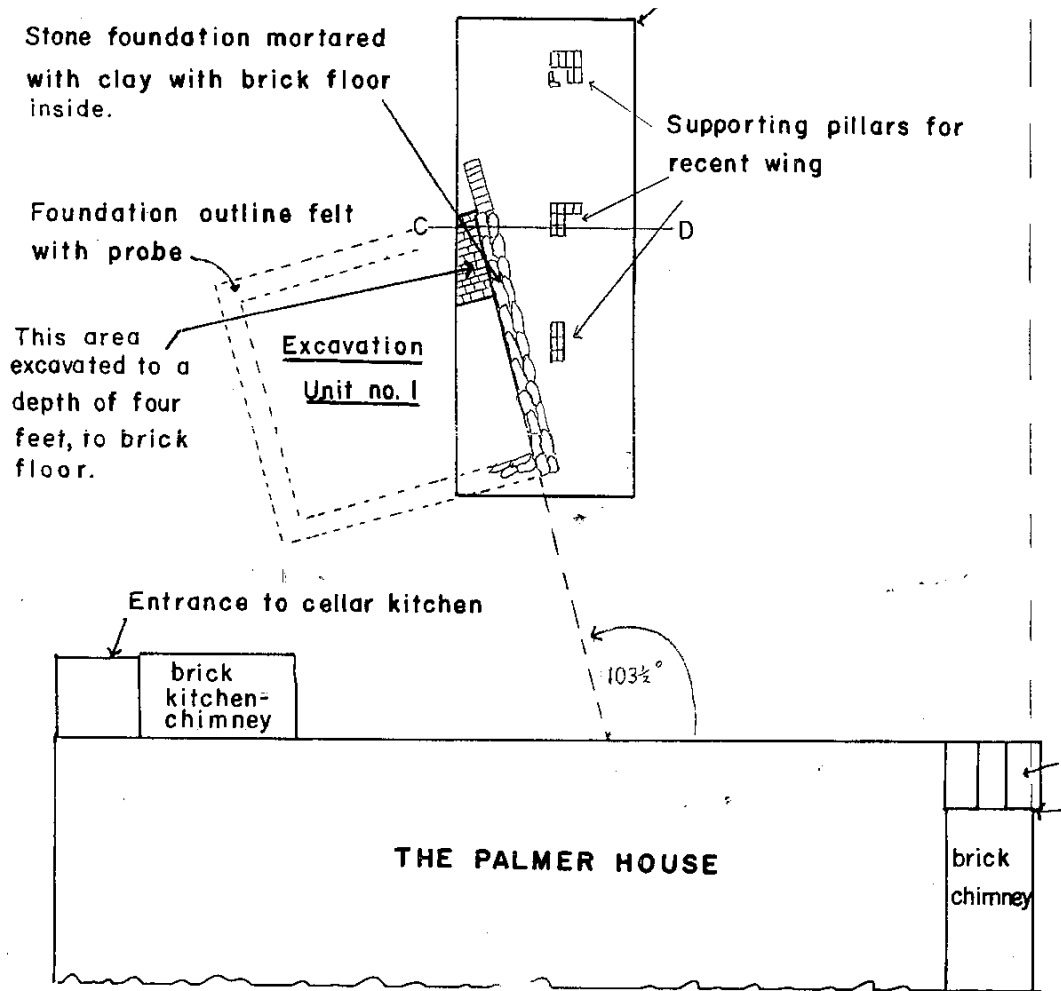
1960 site drawing depicting the angle of South's unit 1 against the Palmer-Marsh house (original image cropped for better resolution) (Falls 2013:11).
